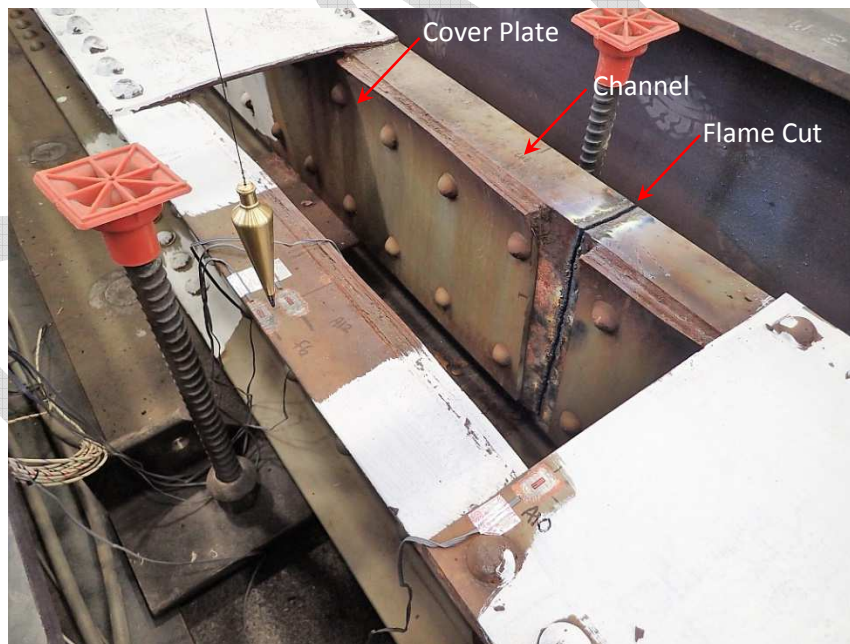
Component cut “A” on Specimen 7 (indicated in Figure 3.24)
